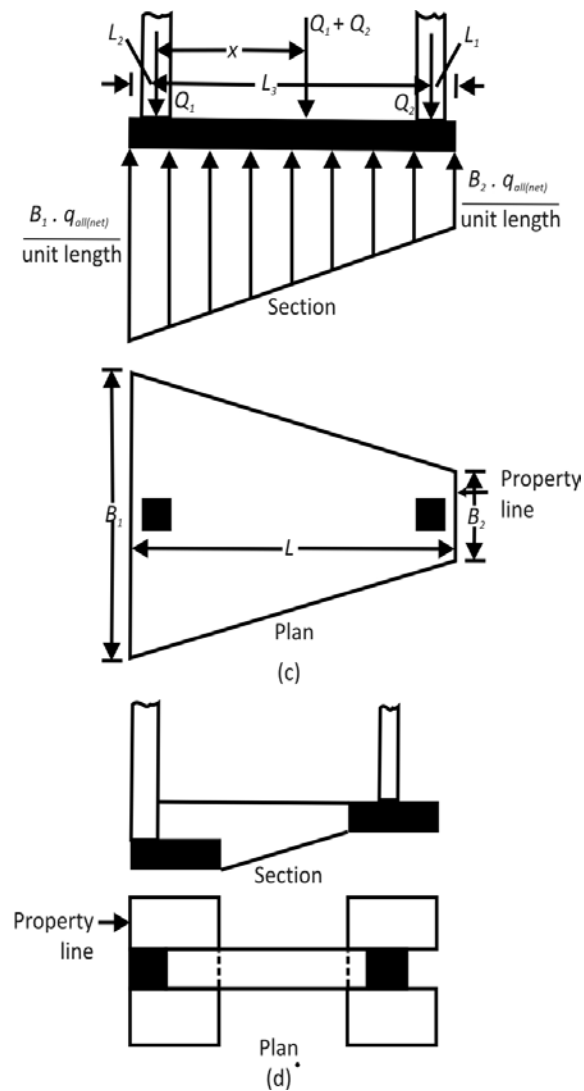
(Continued) (c) Trapezoidal combined footing; (d) cantilever footing
